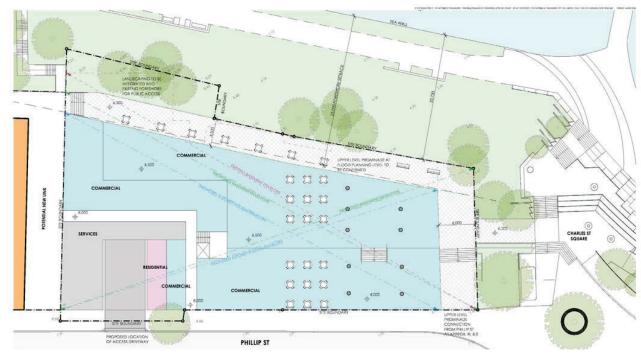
Proposed Ground Floor Plan (Source: PTI Architects)
